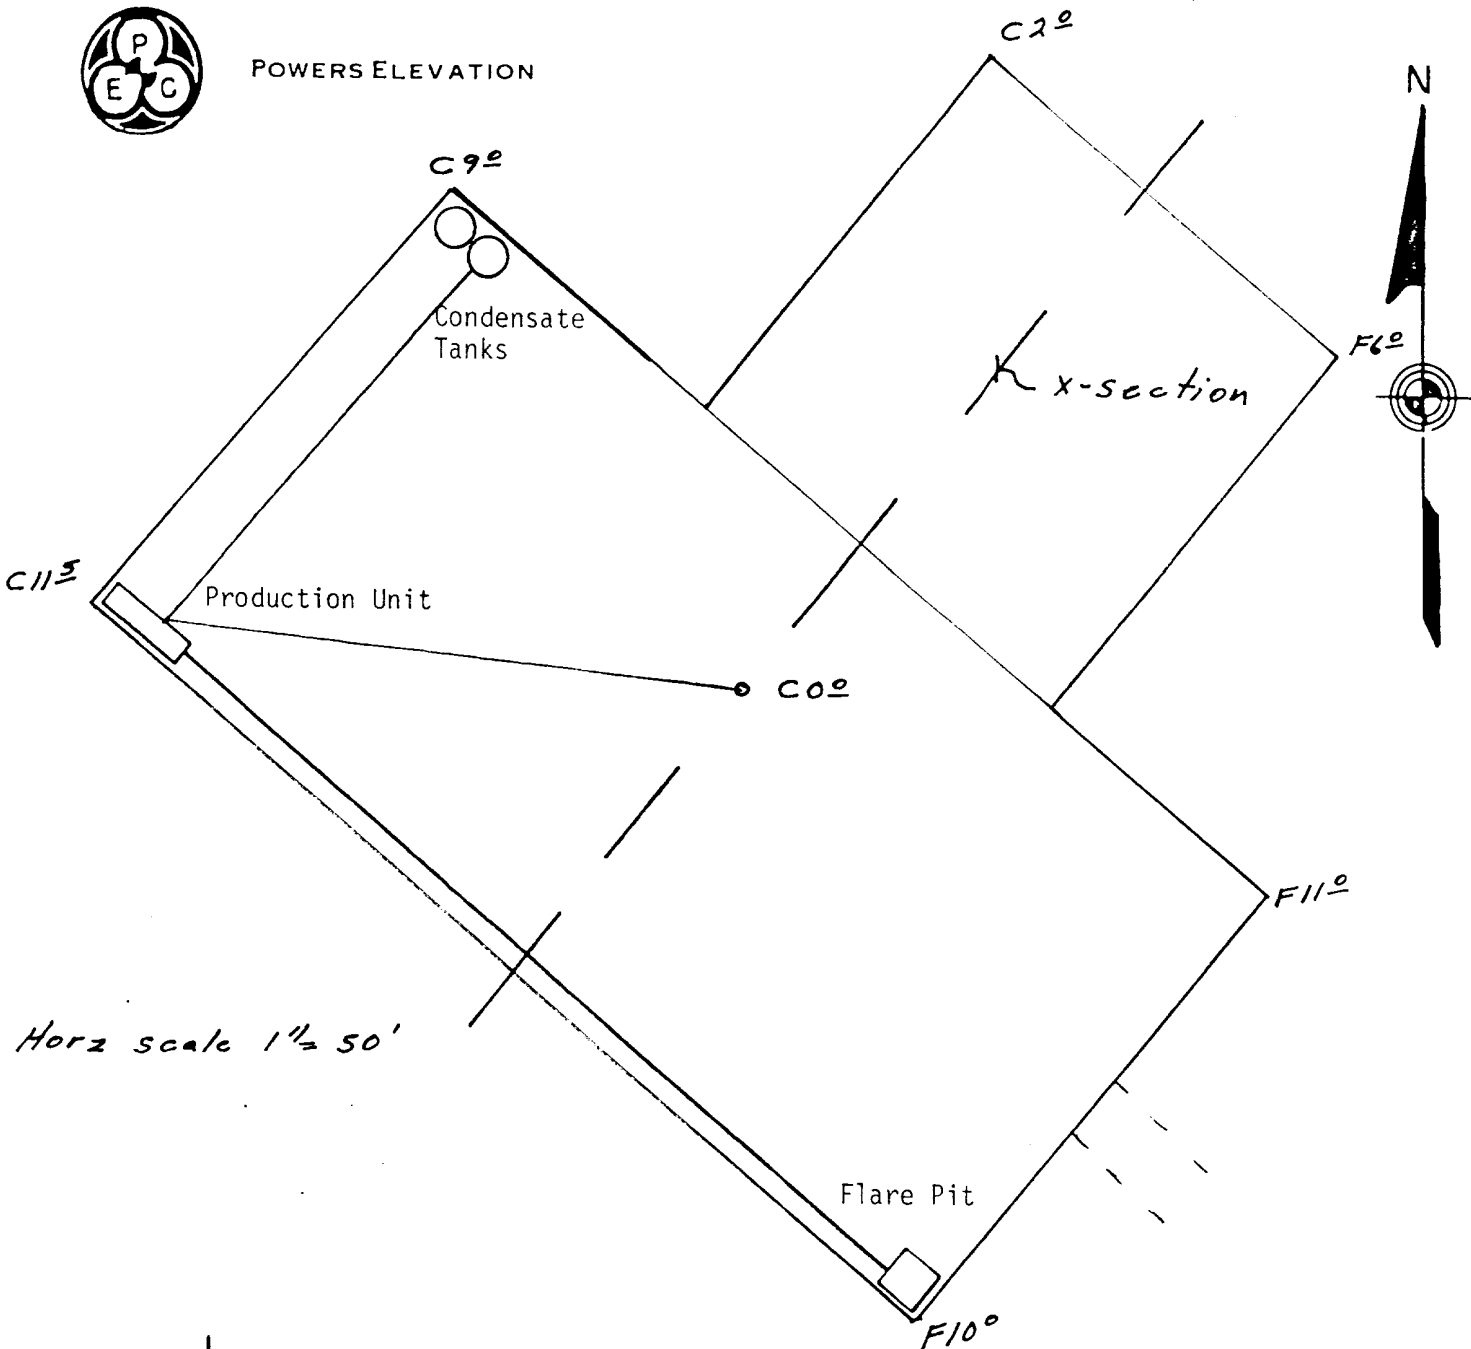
EXHIBIT "G" - Drill Pad Layout, Prod-Facilities Layout & Cut-Fill Cross Section
